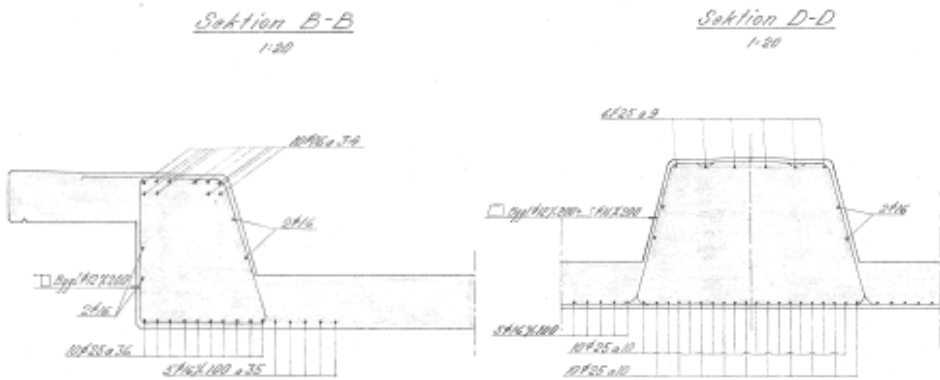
Figure J Reinforcement drawing of the edge beam and centre beam respectively
